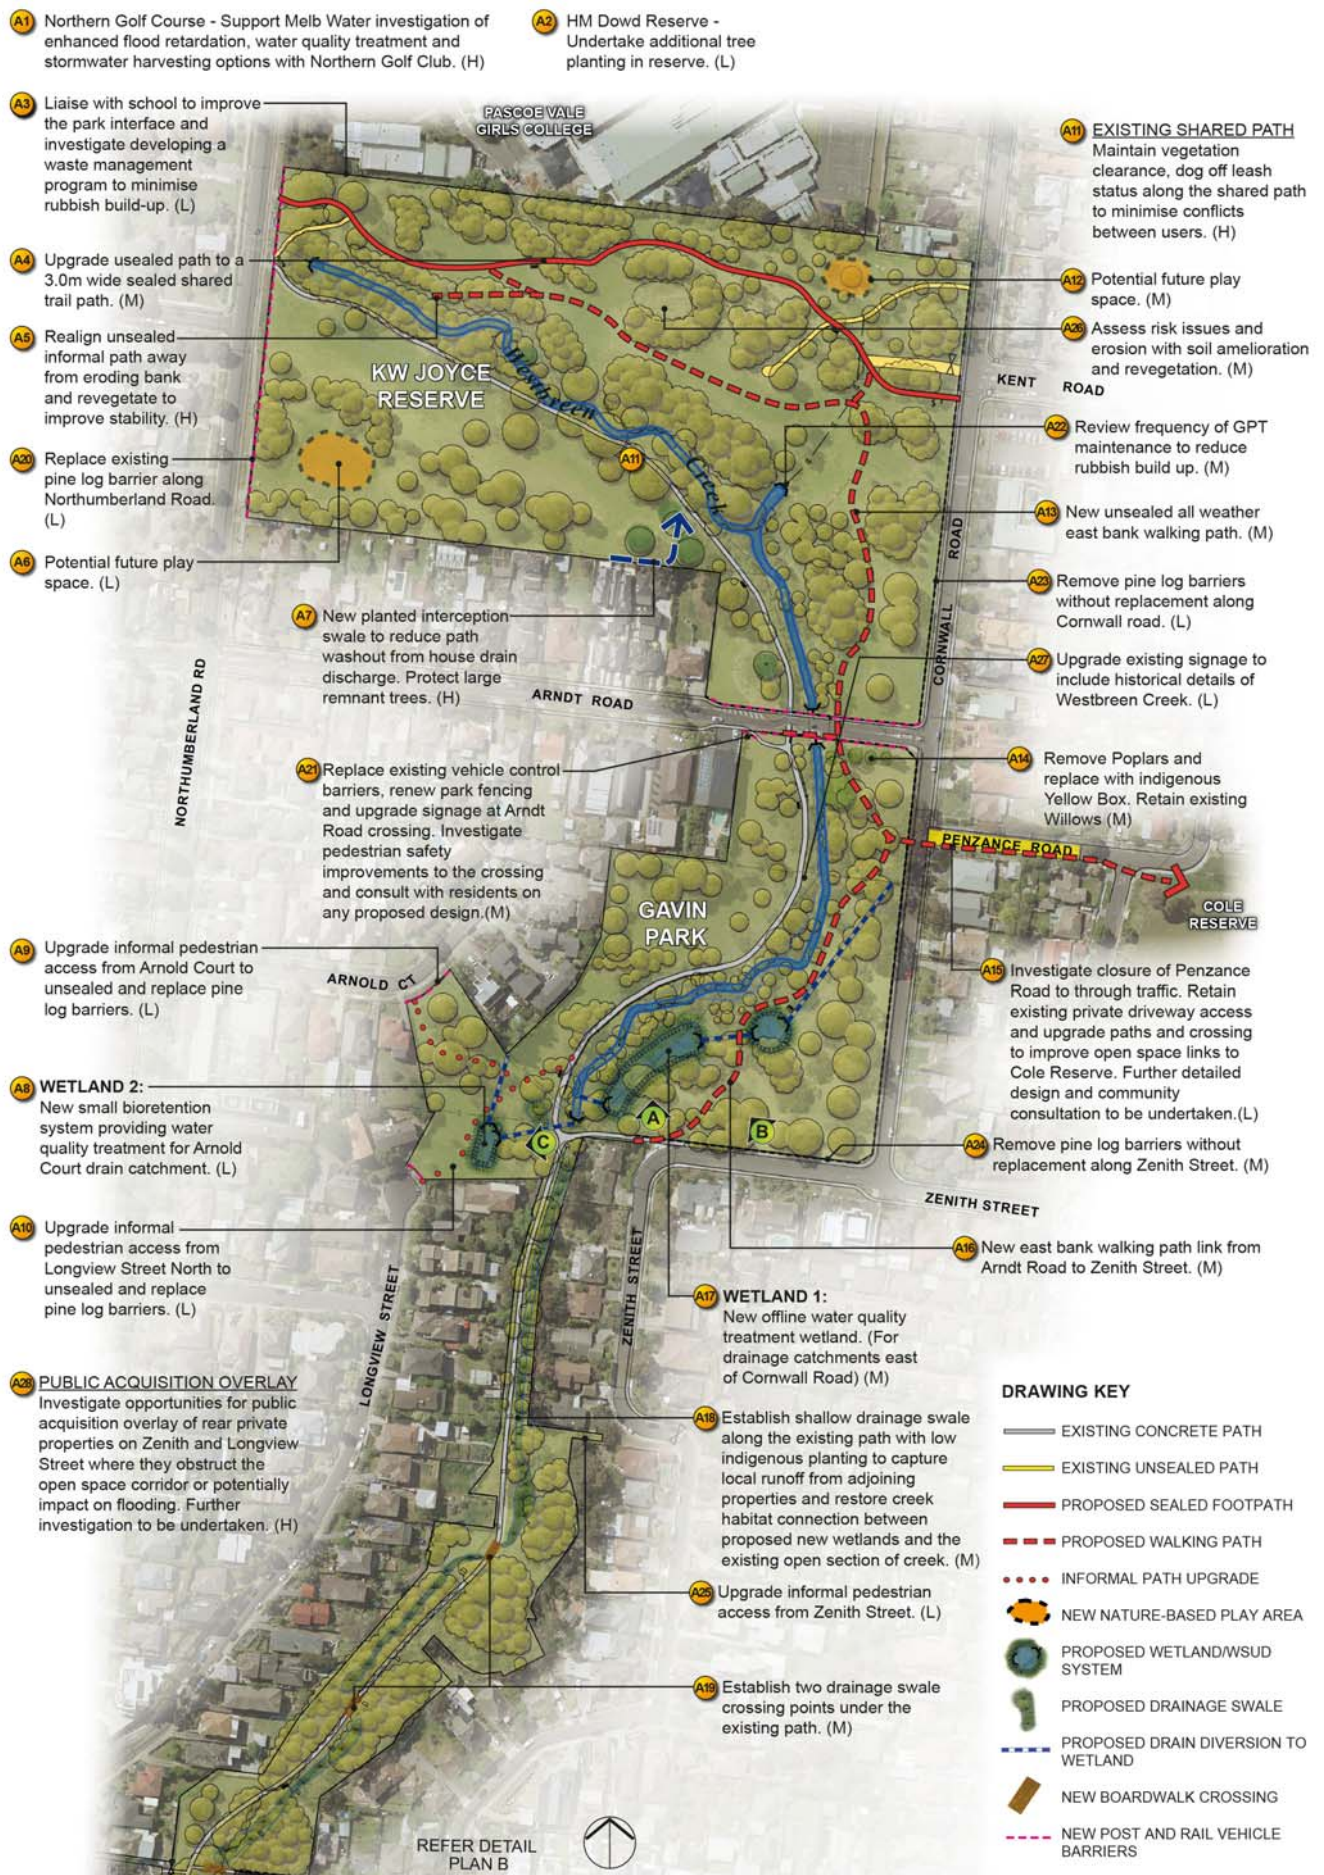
Detail Plan A – KW Joyce Reserve and Gavin Park North
